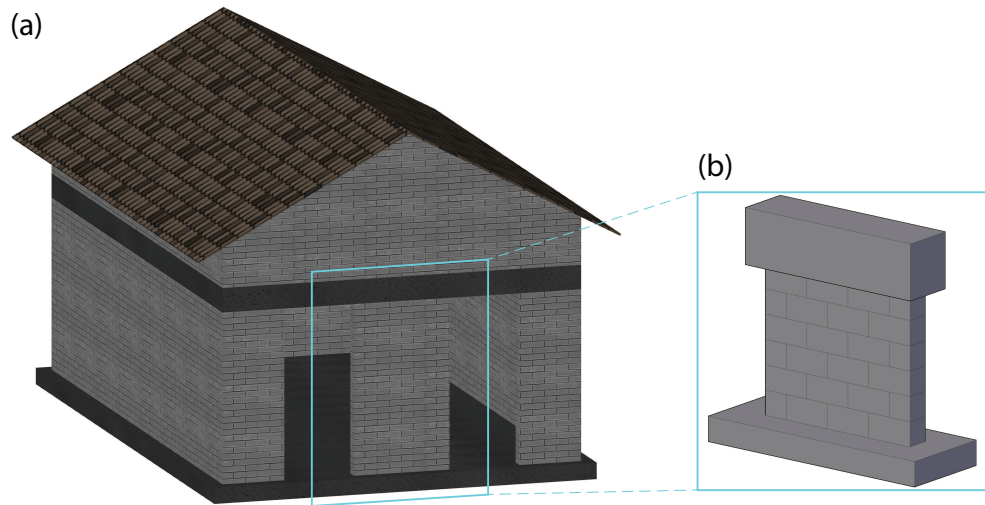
Representation of a specimen design in real-world application: (a) masonry building, and (b) representative masonry wall specimen
